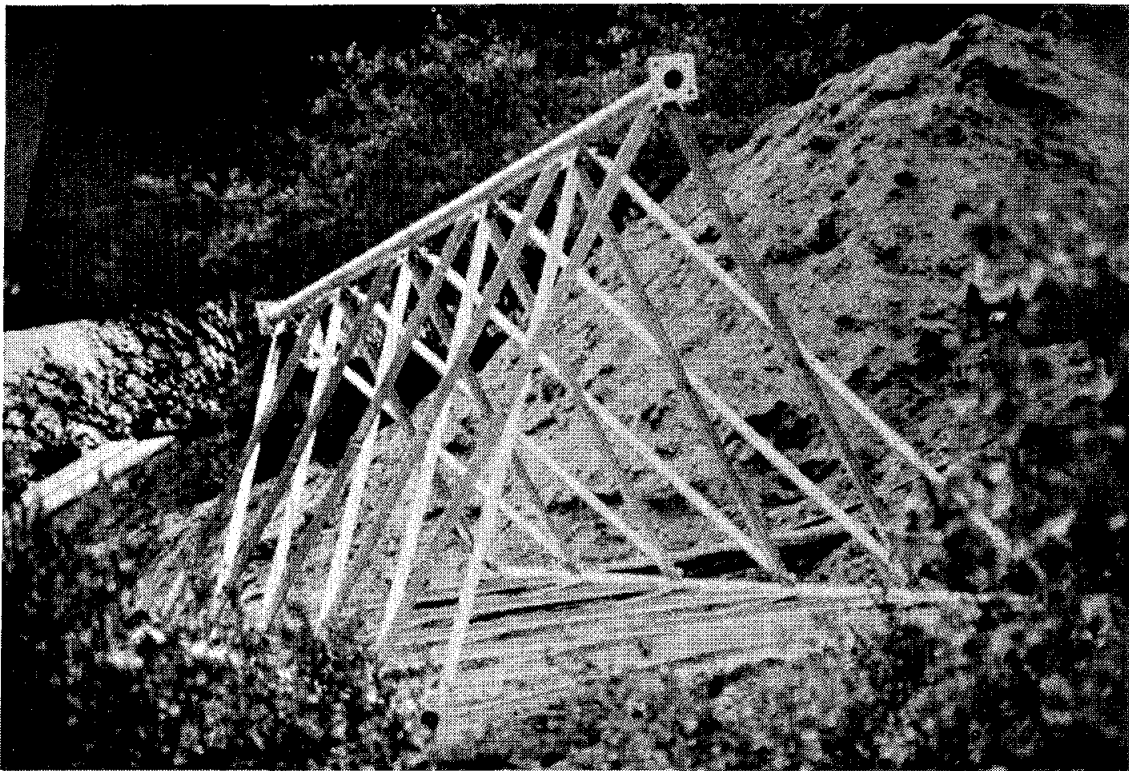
Steel piling anchor for guyed tower in Kotzebue (Source: Newell)
